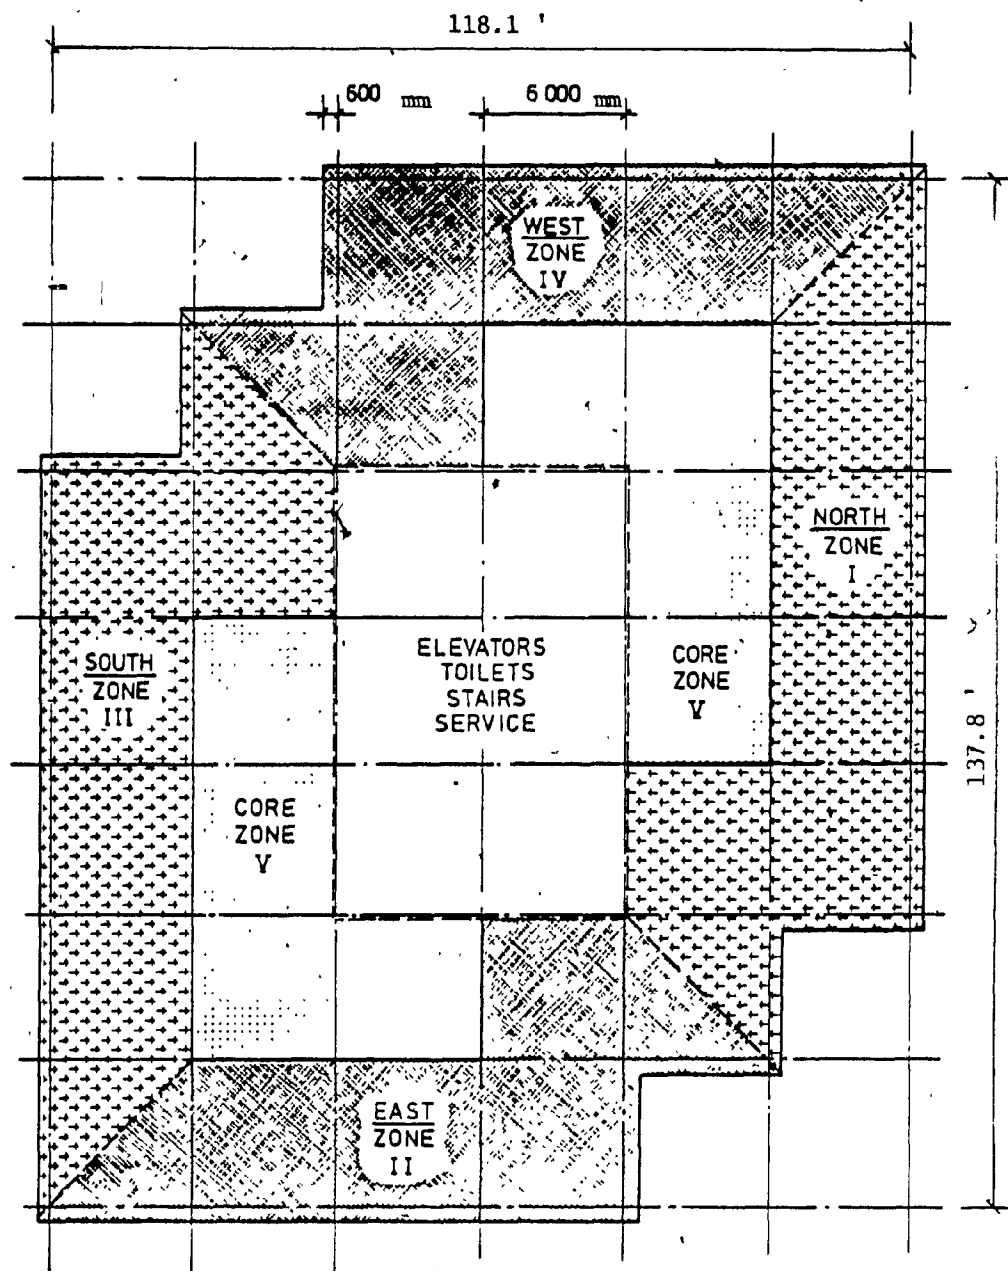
FLOOR PLAN (TYPICAL FLOOR)
